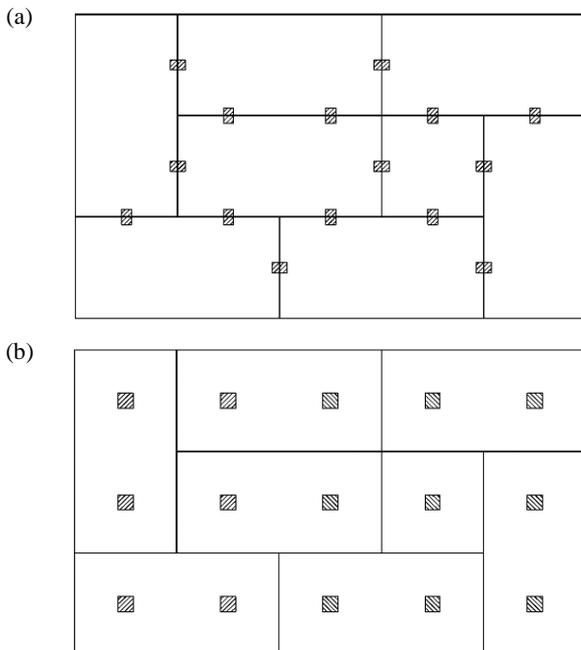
Two JMB layouts: (a) Conventional layout and (b) New layout
